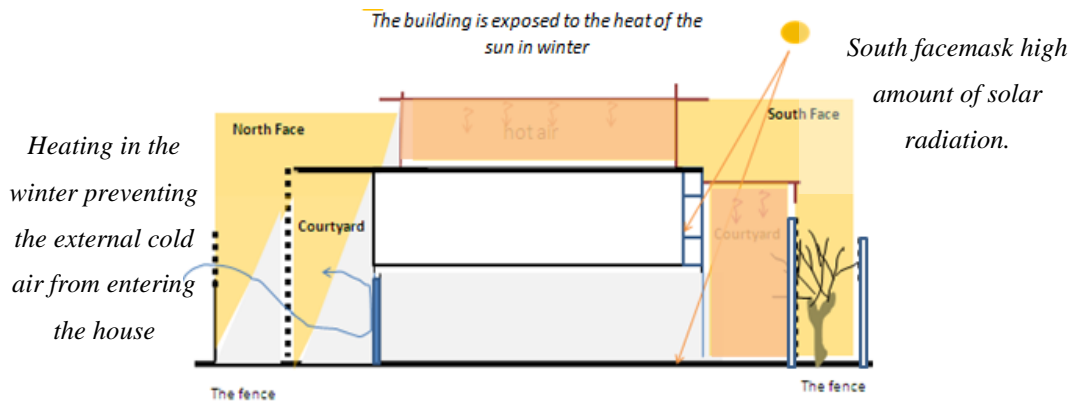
Heating in the winter; preventing external cold air from entering the house.
